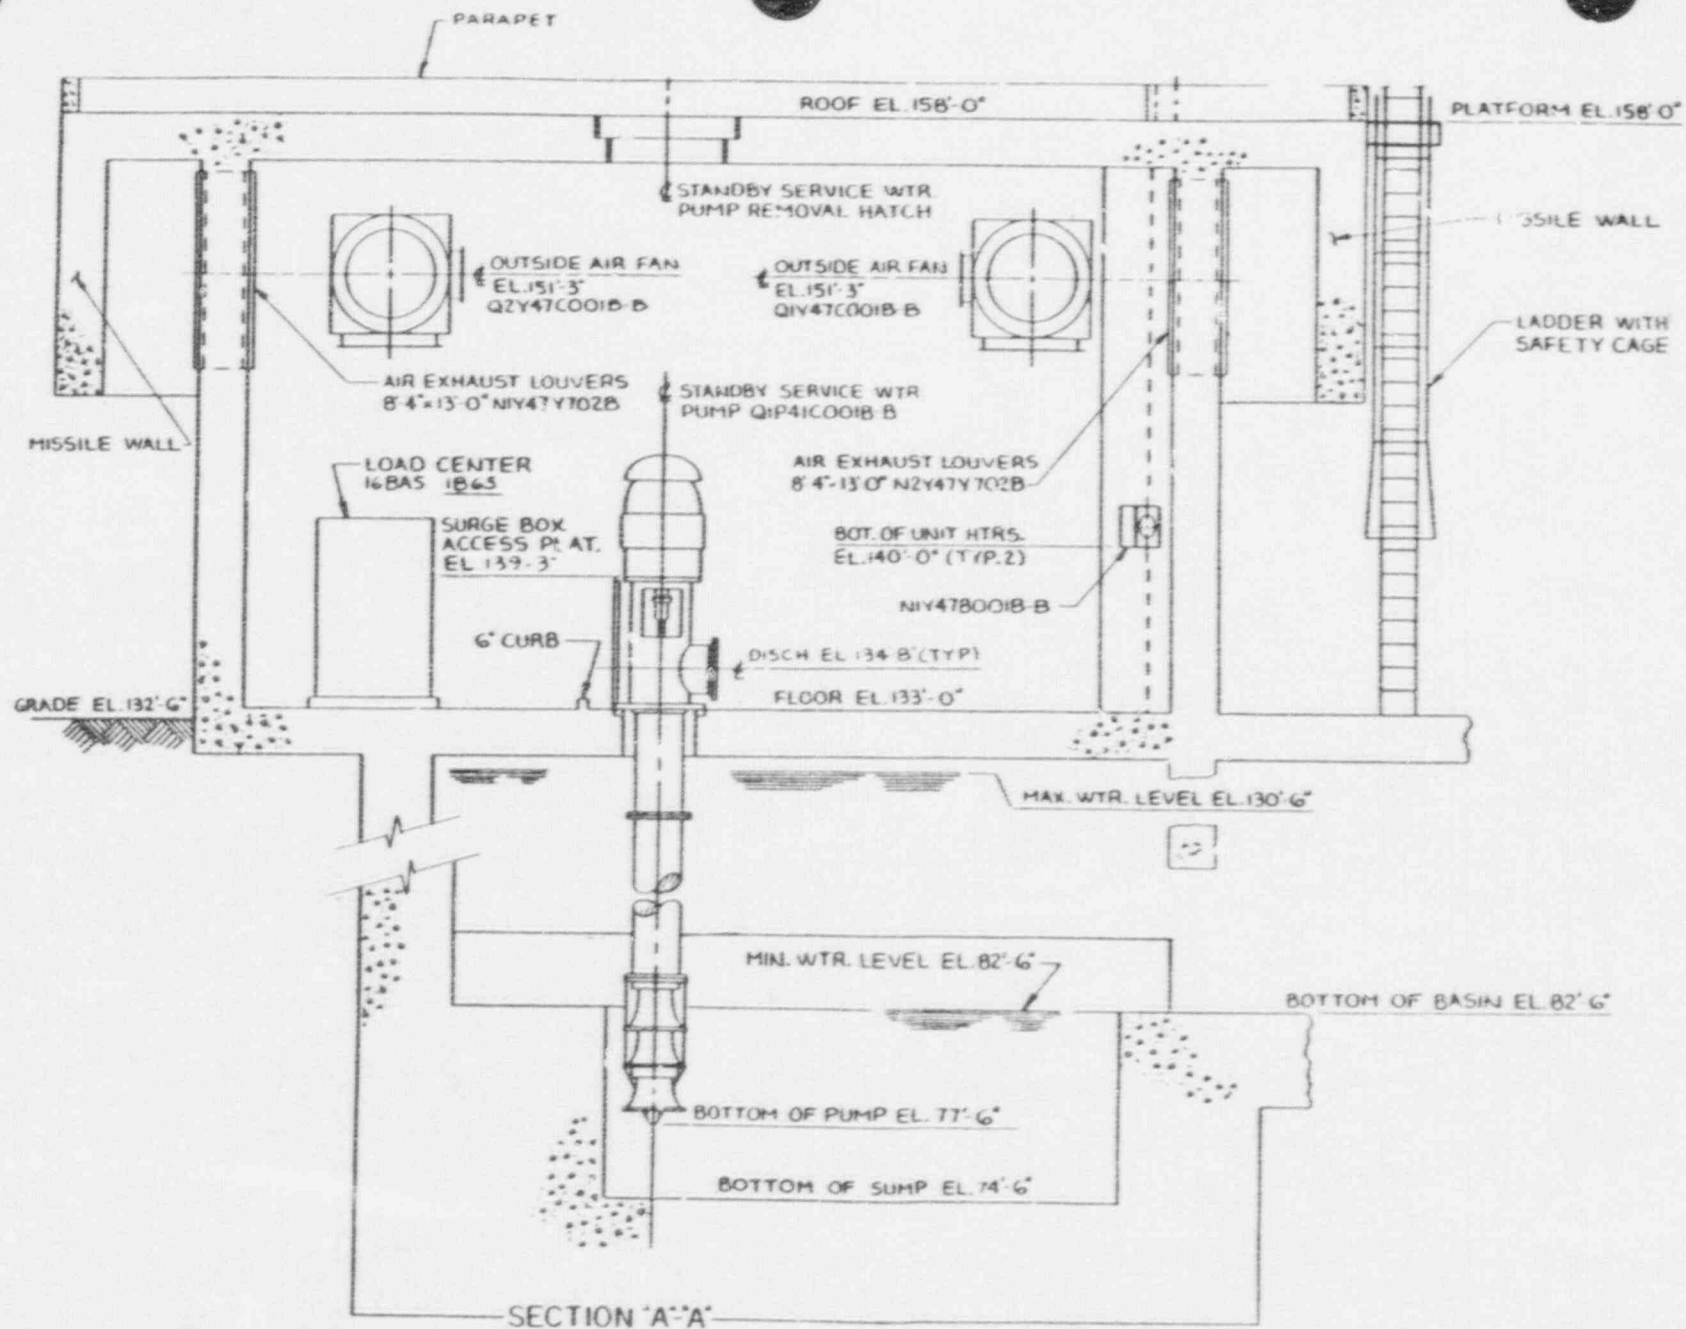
Elevation View of Grand Gulf 1 Cooling Tower Pumphouse (Typical of 2)
